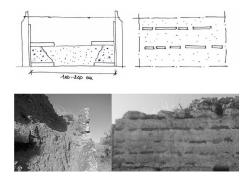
Details of Type 1-wall. Section and elevation of Nules Castle, Castellón (authors).
